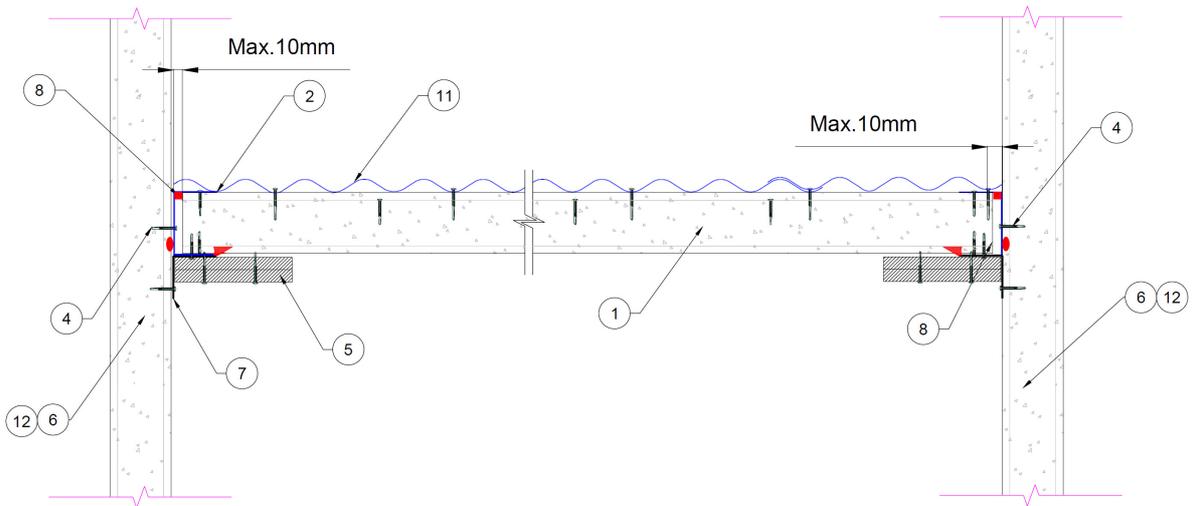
Speedpanel ceiling protected with steel sheeting (Longitudinal Section View)
